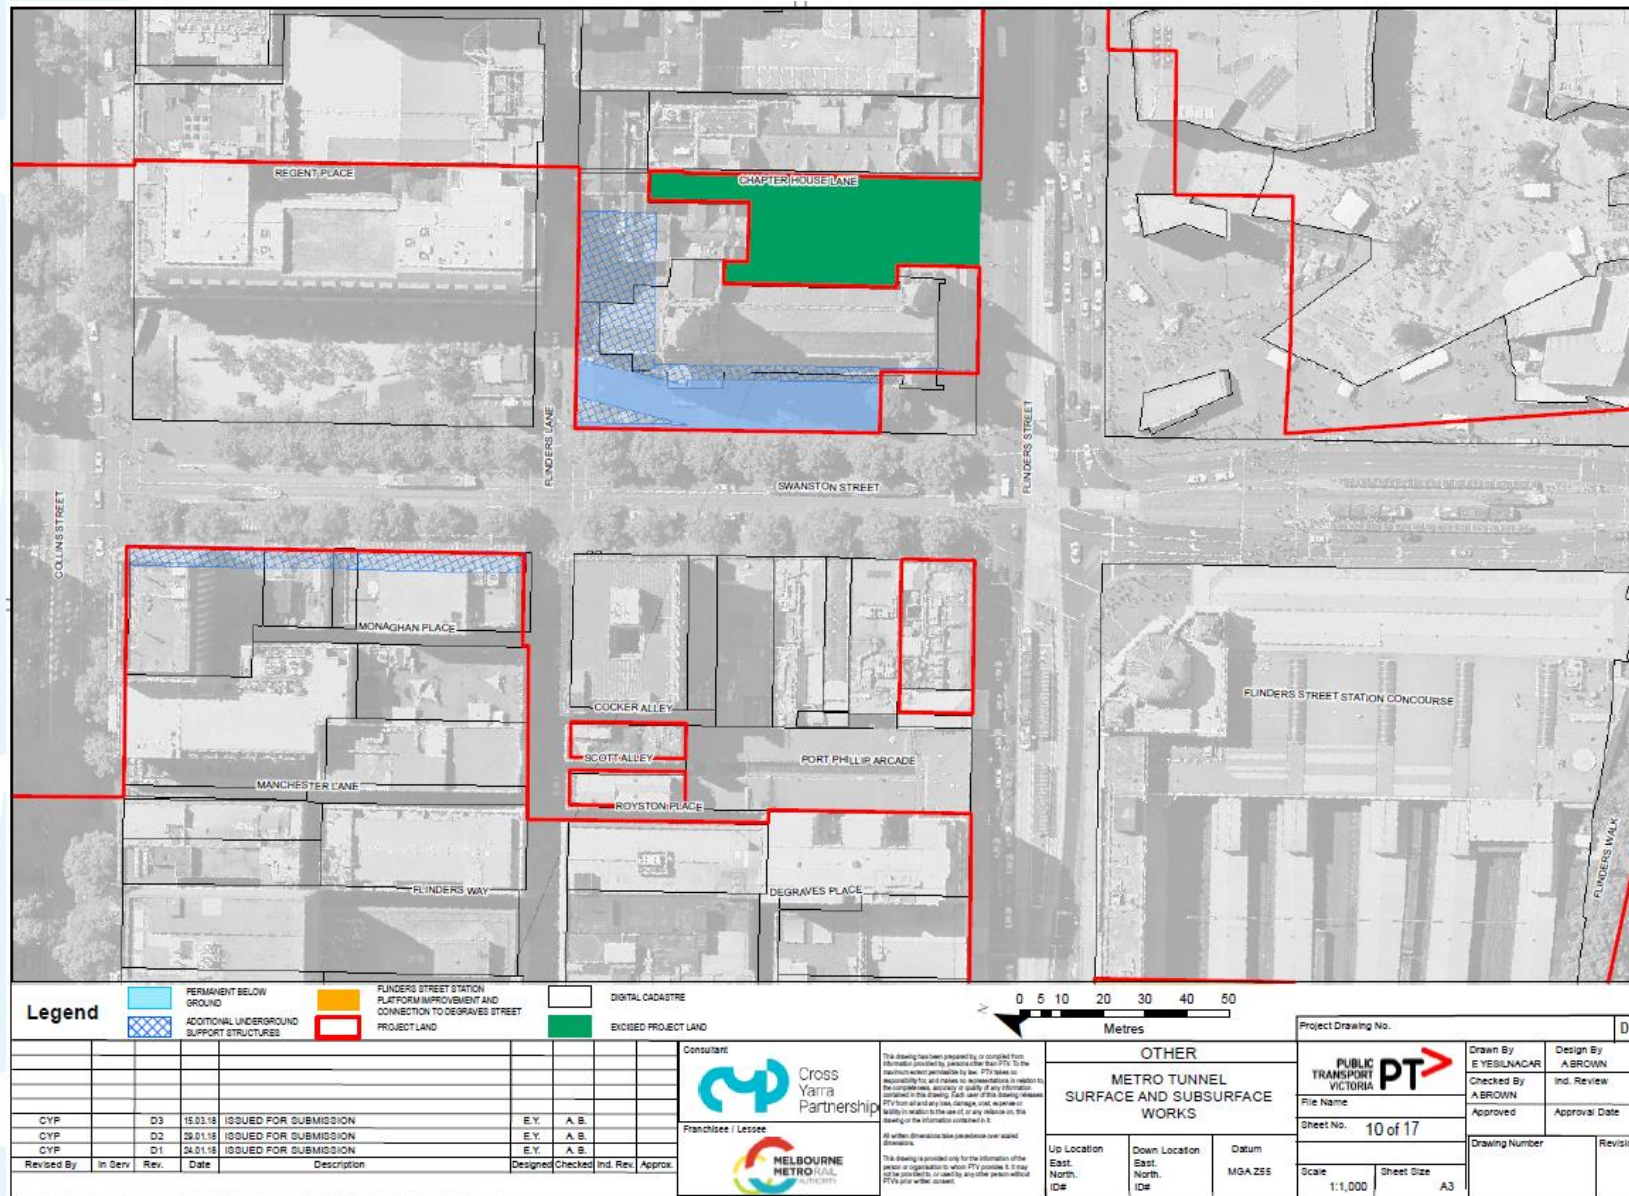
ADDITIONAL PROJECT LAND REQUIRED FOR PERMANENT BELOWGROUND, UNDERGROUND SUPPORT STRUCTURES AT CBD SOUTH STATION AND EXCISED LAND
